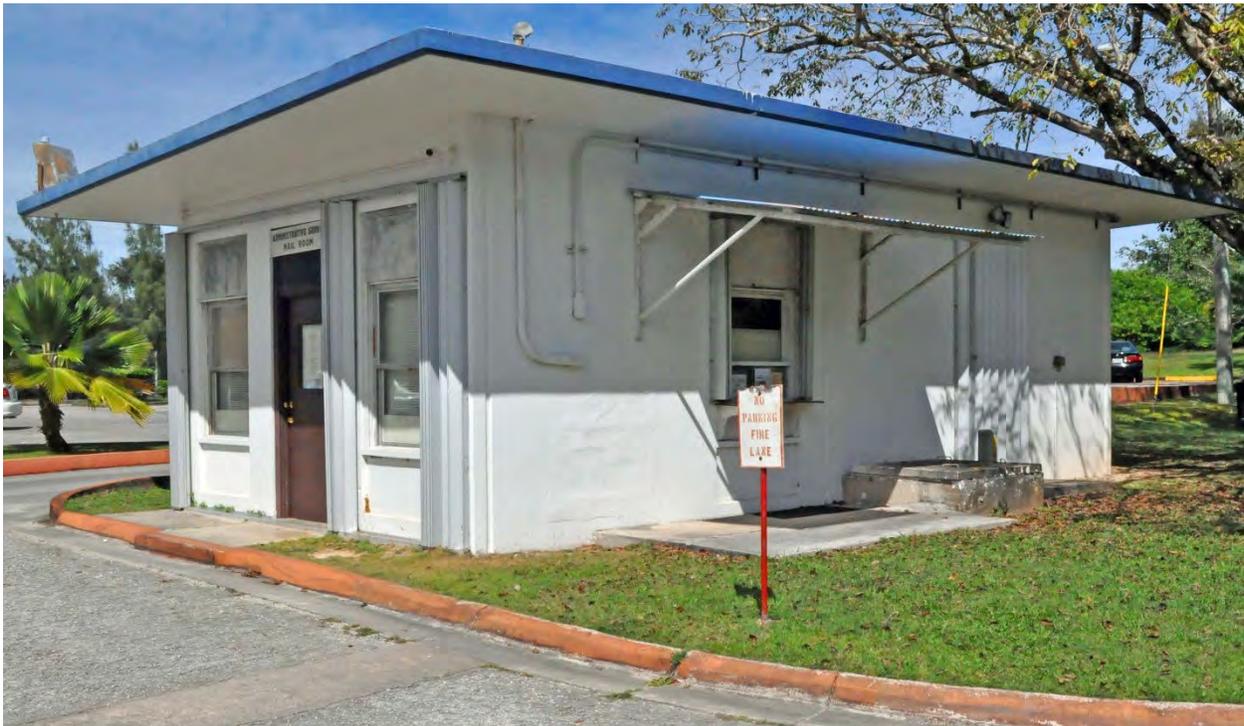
Feature 2, north elevation. This elevation has had most of the original windows blocked in.
